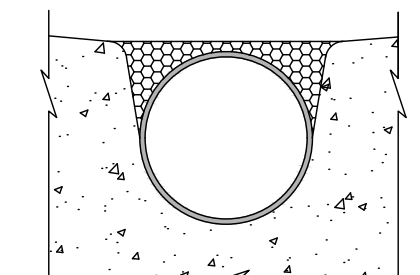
H: PLACE FORMWORK AND THEN CONCRETE
